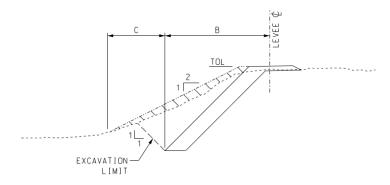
Typical Mitigation Section (Sta. 528+00 to Sta. 540+00)
